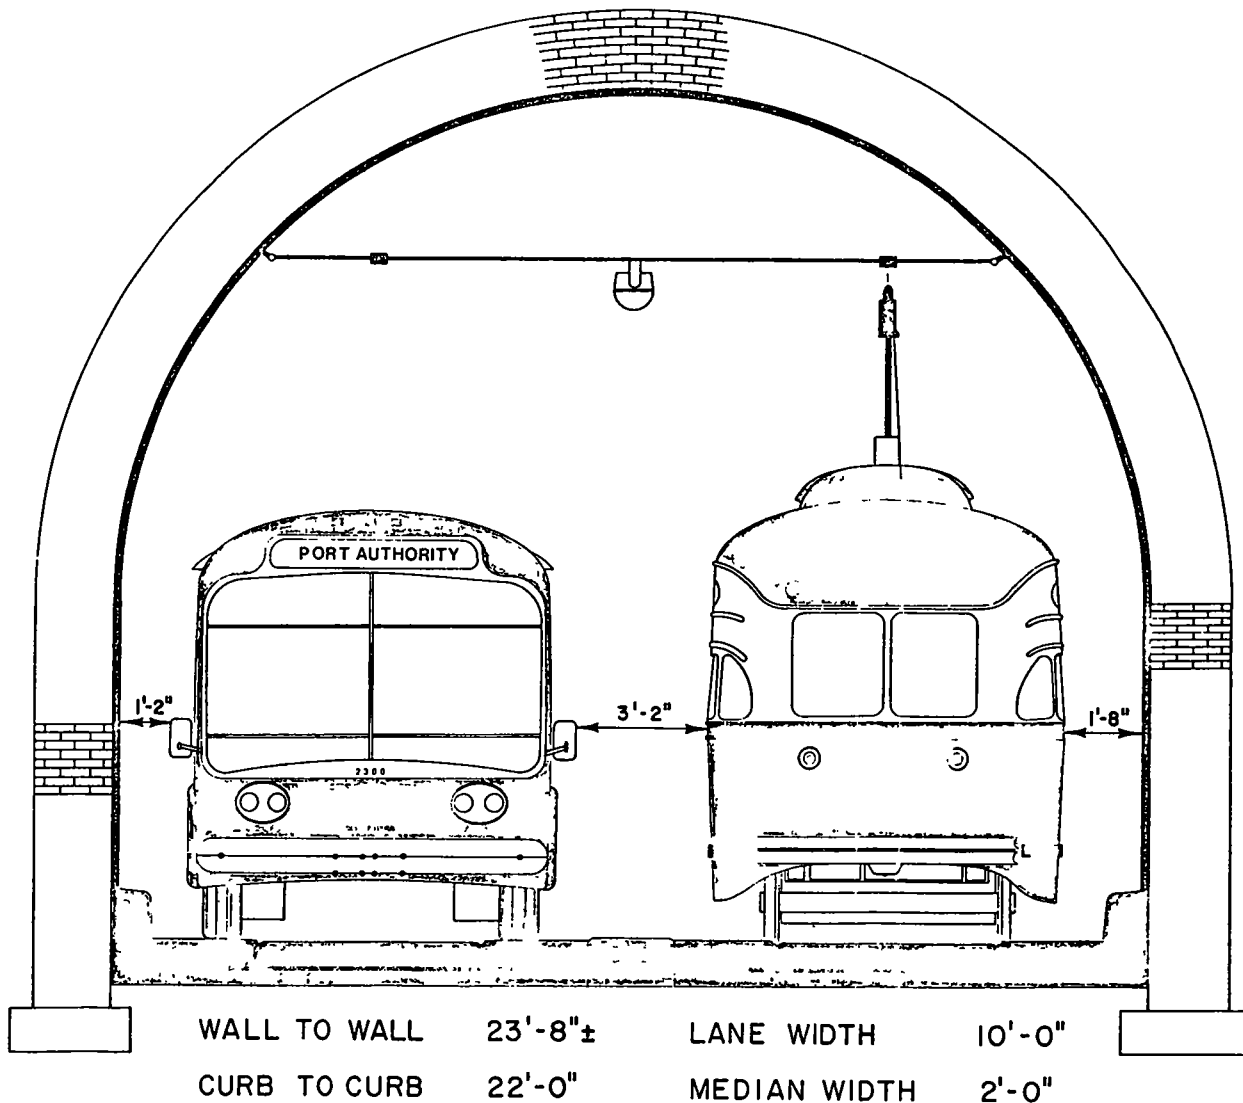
Proposed Mt Washington Tunnel operations, South PATway, Pittsburgh, Pa
